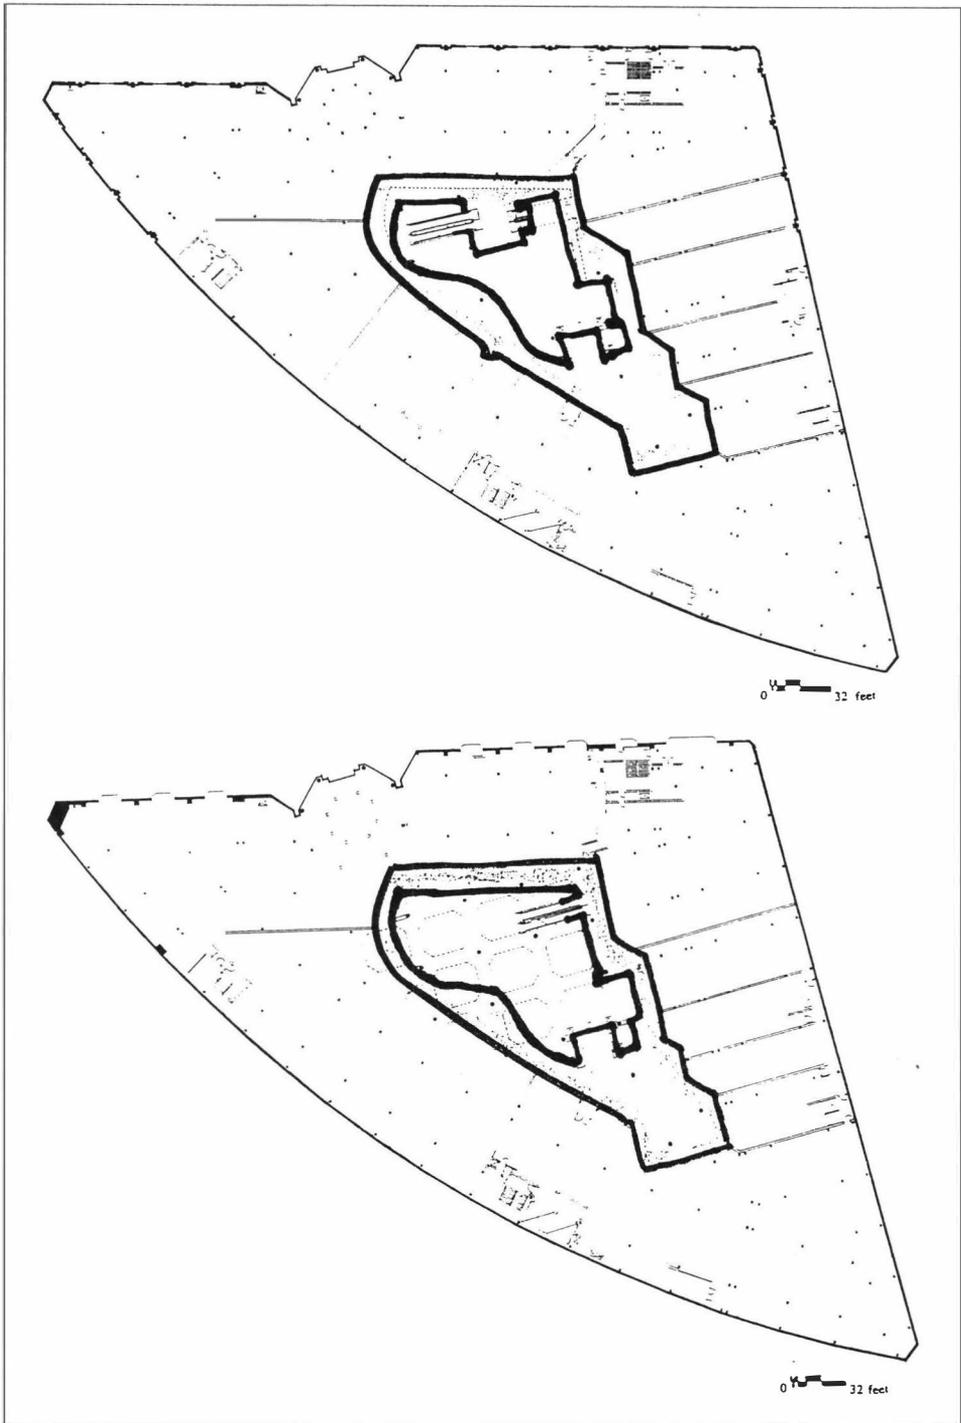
/10 - Third and Fourth Floor Plan Atrium Mall
